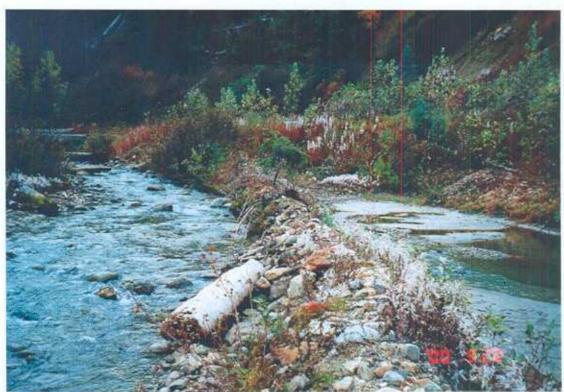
East Fork of Manteau (reach 1) – Berm constructed to protect road prism adjacent to bridge on Road 1211.
